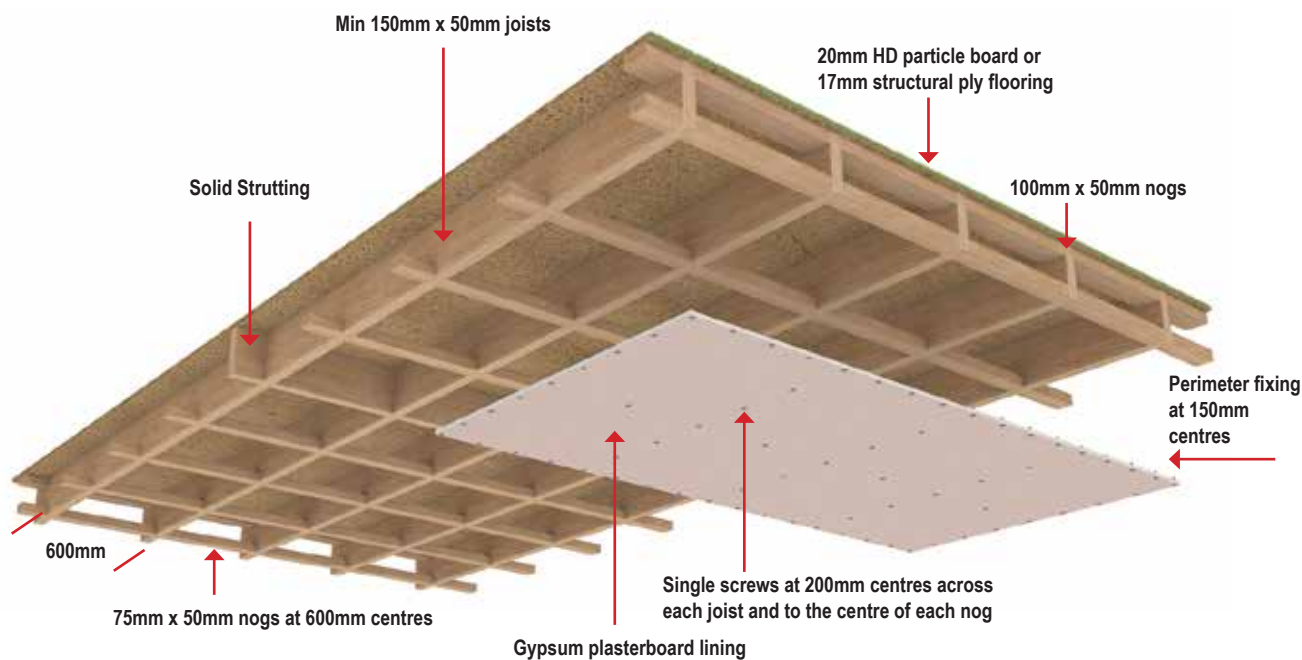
Typical fire-rated light timber floor assembly. GIB® Fire Rated Systems, 2018.
